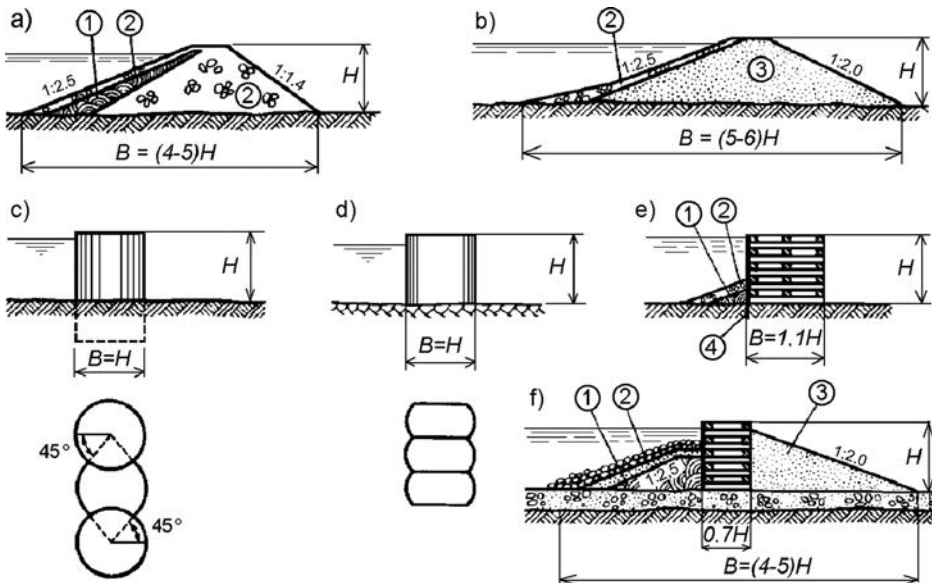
Cross-sections of cofferdams (after Grishin et al., 1979). (a) Rockfill cofferdam with earthen facing; (b) sand cofferdam; (c) cylindrical oval cofferdam made of steel sheet piling; (d) segmental oval cofferdam made of steel sheet piling; (e) cofferdam with a wide wooden grille; (f) cofferdam with a narrow wooden grille. (1) Earthen water-impermeable part; (2) rockfill; (3) sand; (4) wooden timber piling.
